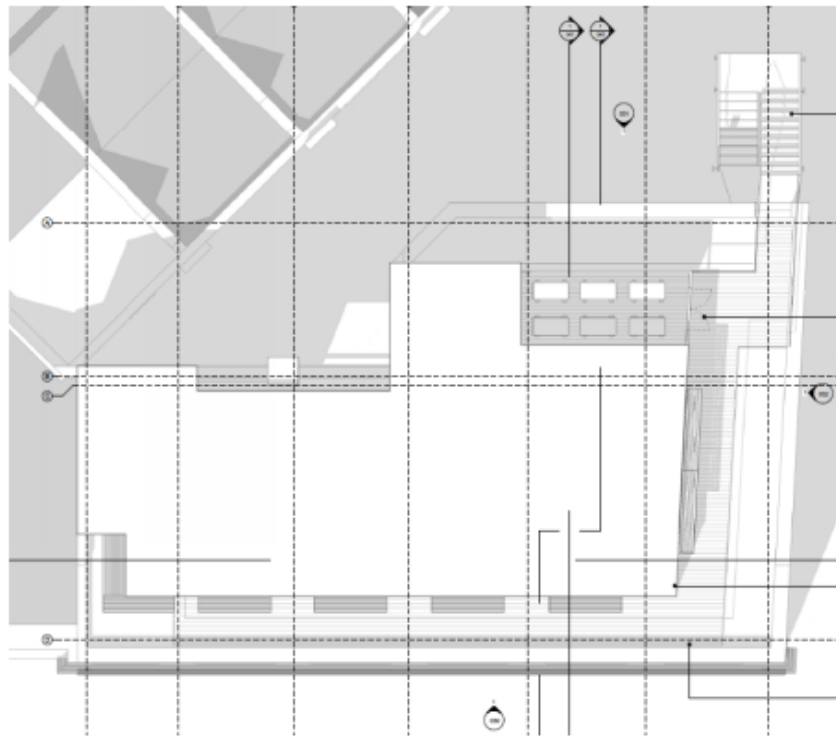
Proposed roof plan indicating position of plant equipment and enclosure
